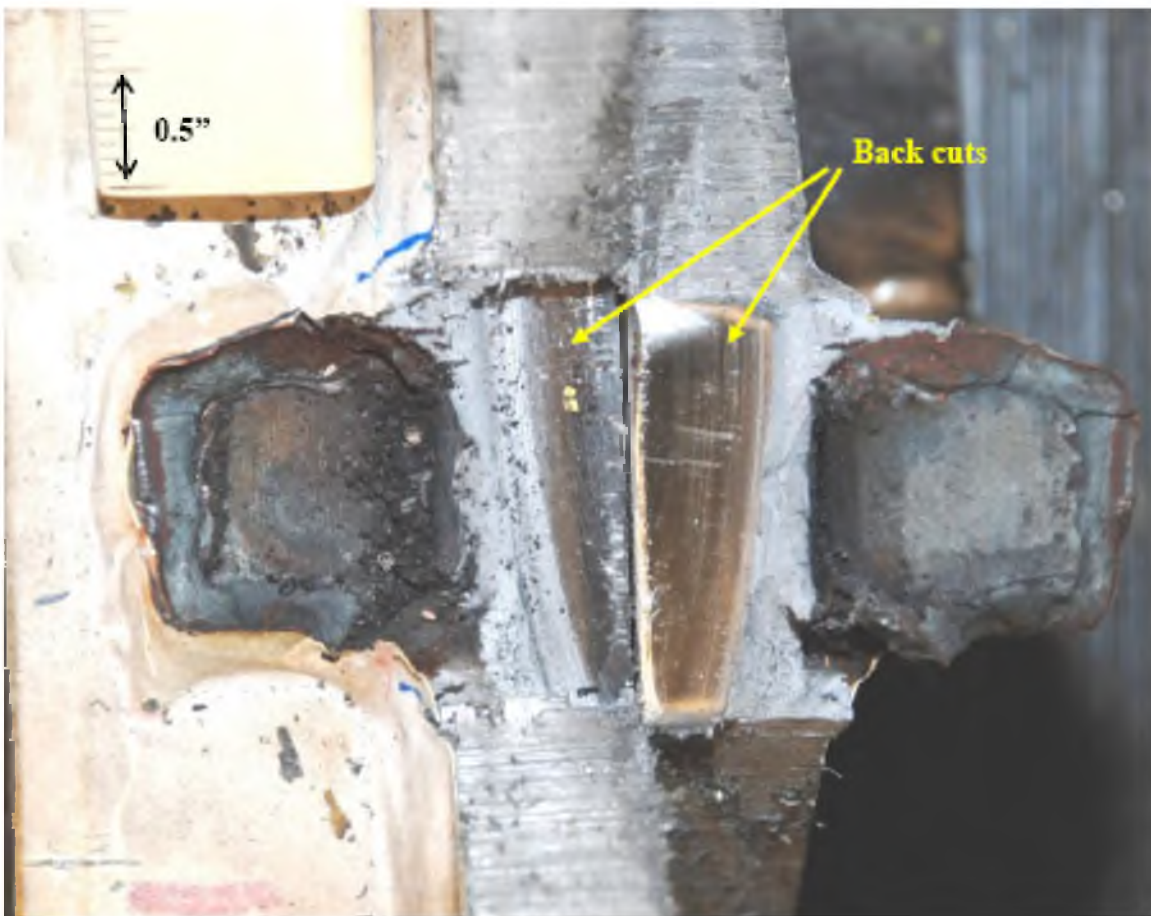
Bearing support sections containing cracks 1 & 2 at ends of the spokes
